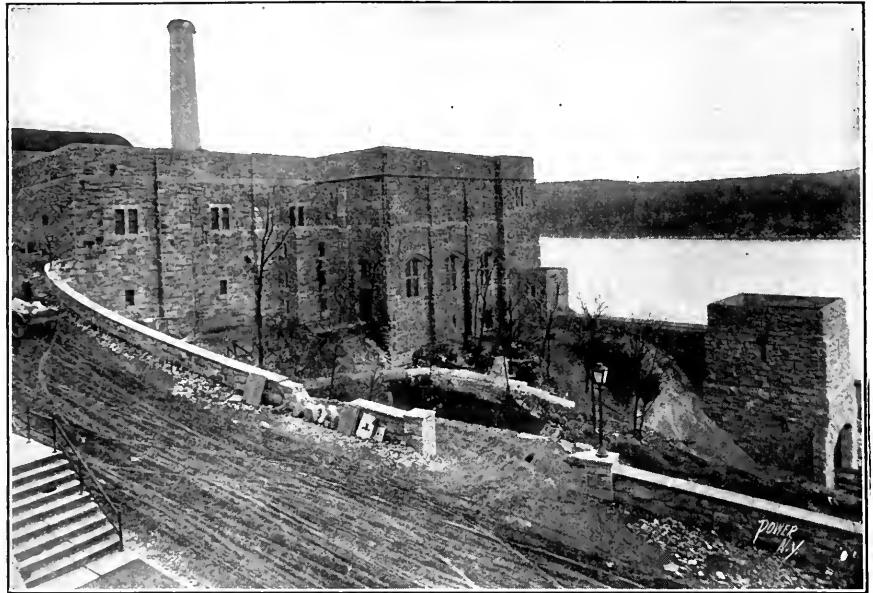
VIEW OF POWER PLANT FROM THE ROAD
